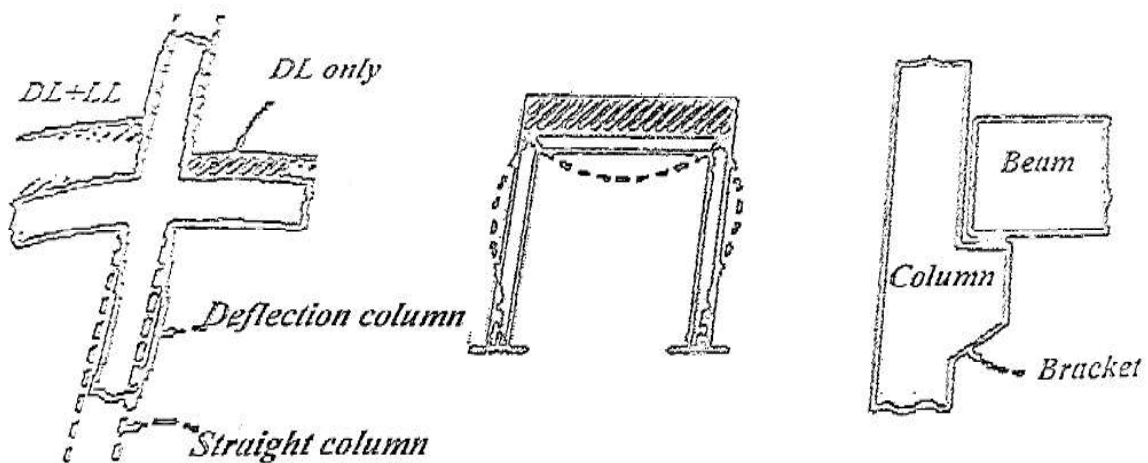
Eccentric loaded conditions on column (Ibrahim et. al., 2011).
